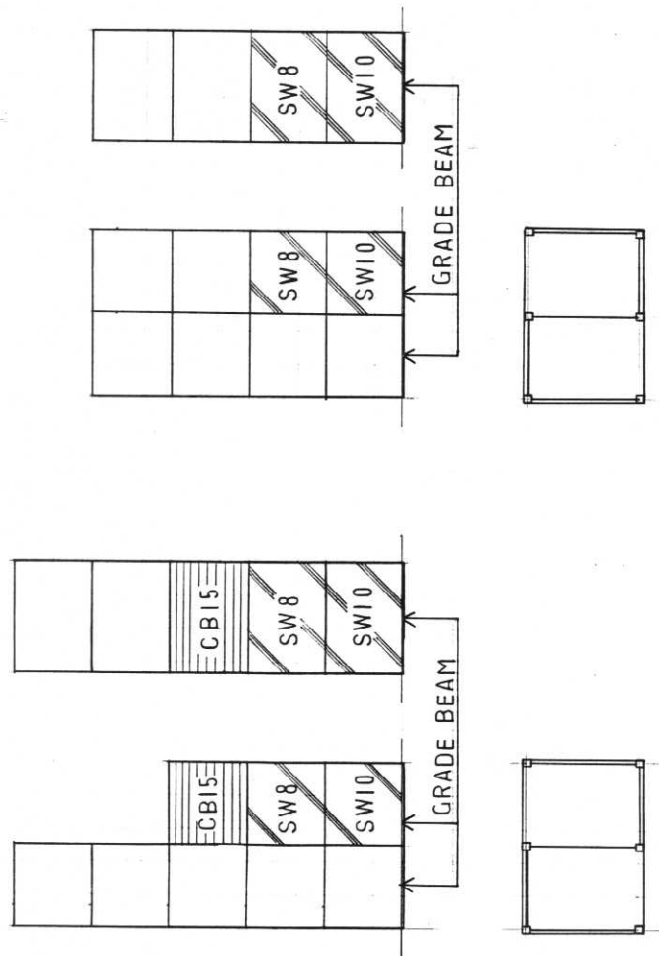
(1) Recommended Seismic Reinforcement Methods for a Single Family House
